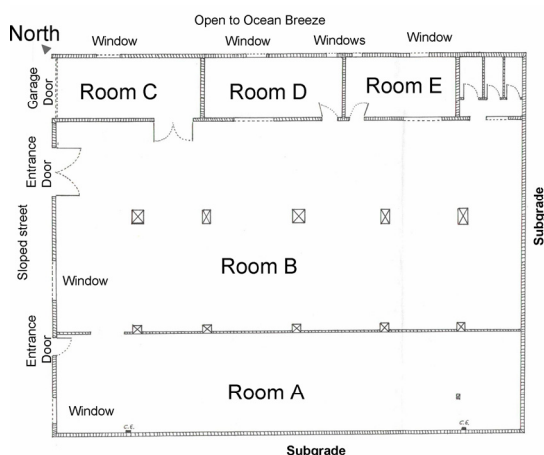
Floor plan of the museum storage in Valle de Guerra.
